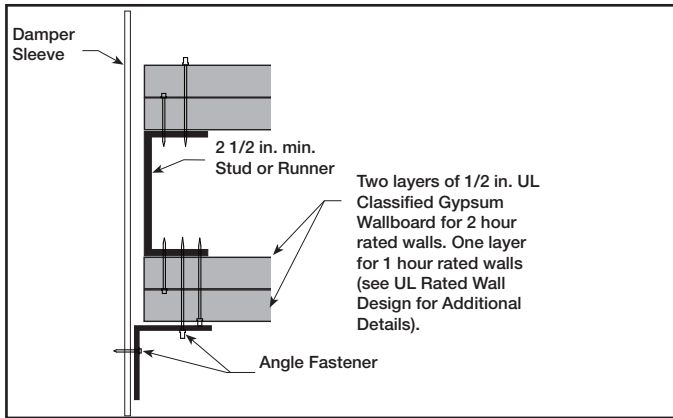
Single Side Angle With Steel Stud Wall - Angle Over Wallboard
